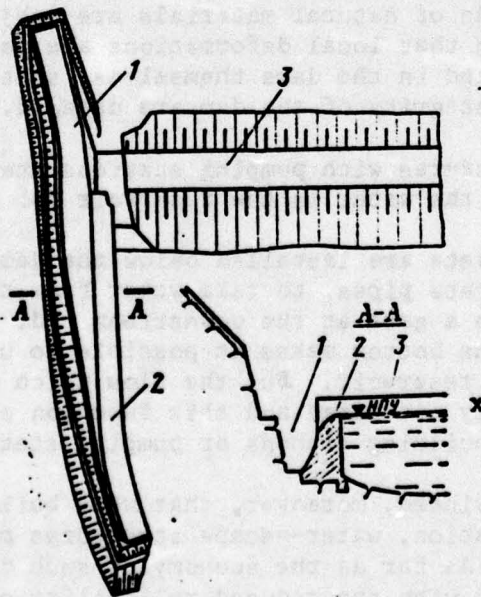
Trench-type water escape at the installation on the Myaundzha River.
